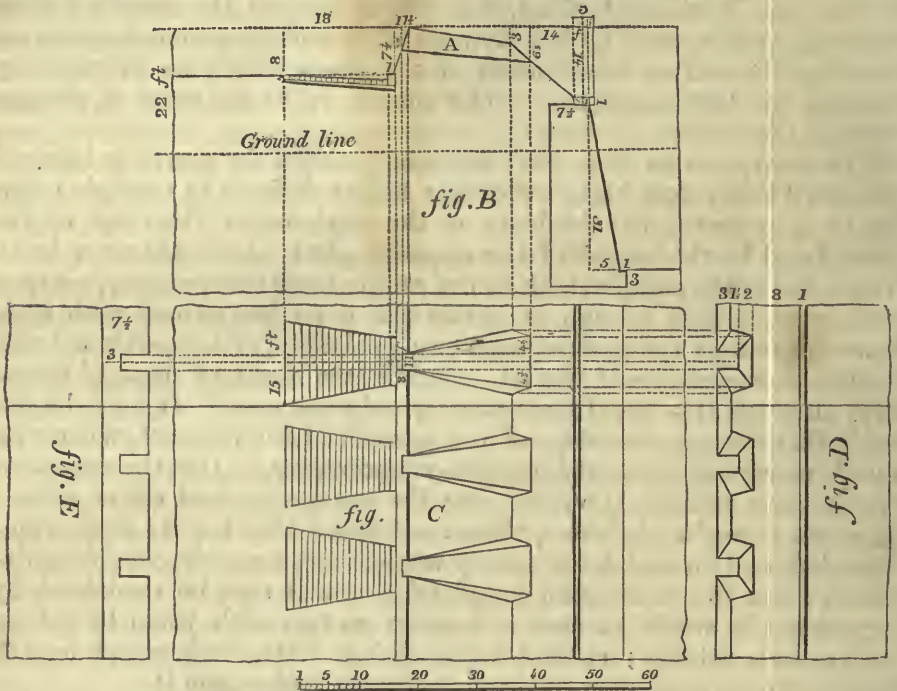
Fig. B Section made across an Embrasure; the cheek A seen in elevation; and a Section of the Gun Platform in rear of the Parapet.
